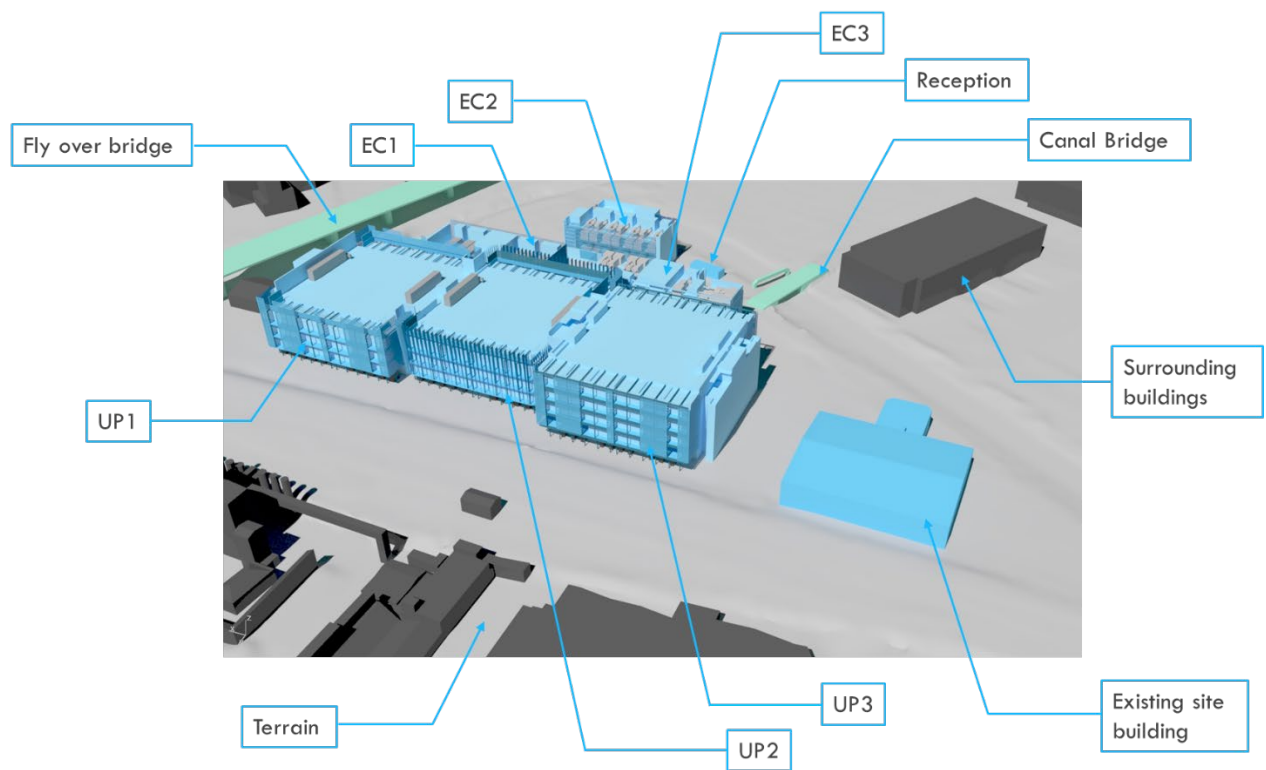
South close-up perspective view of the modelled existing site and surrounding buildings.
